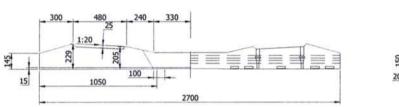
4 Design of ferroconcrete sleepers (mm)
